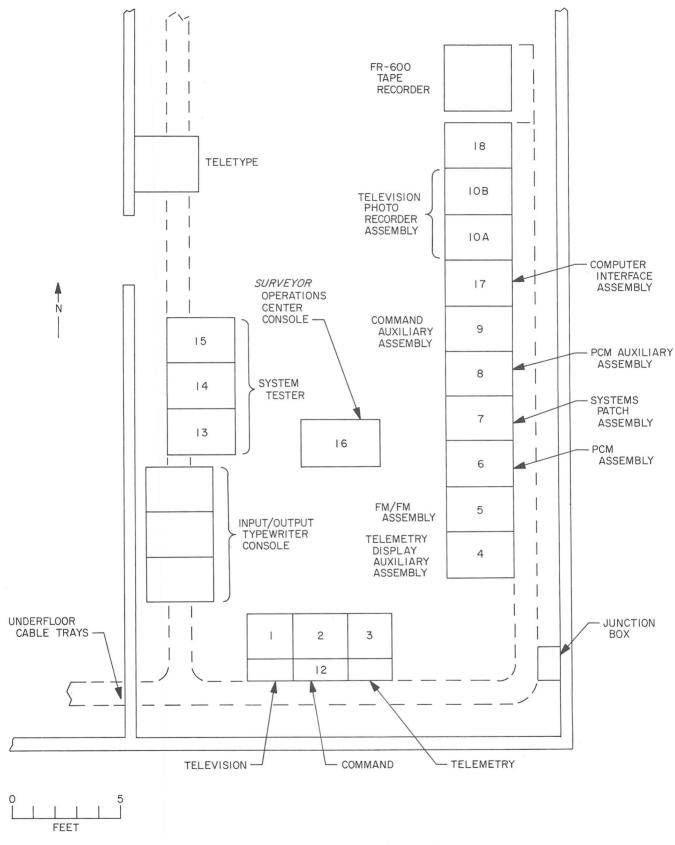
Floor plan of CDC 1 at DSS 11
